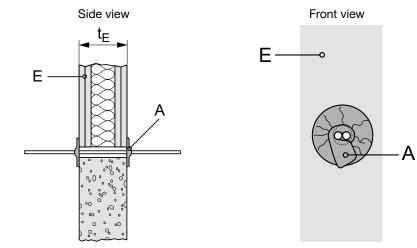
Hilti Firestop Cable Disc CFS-D 25 application
